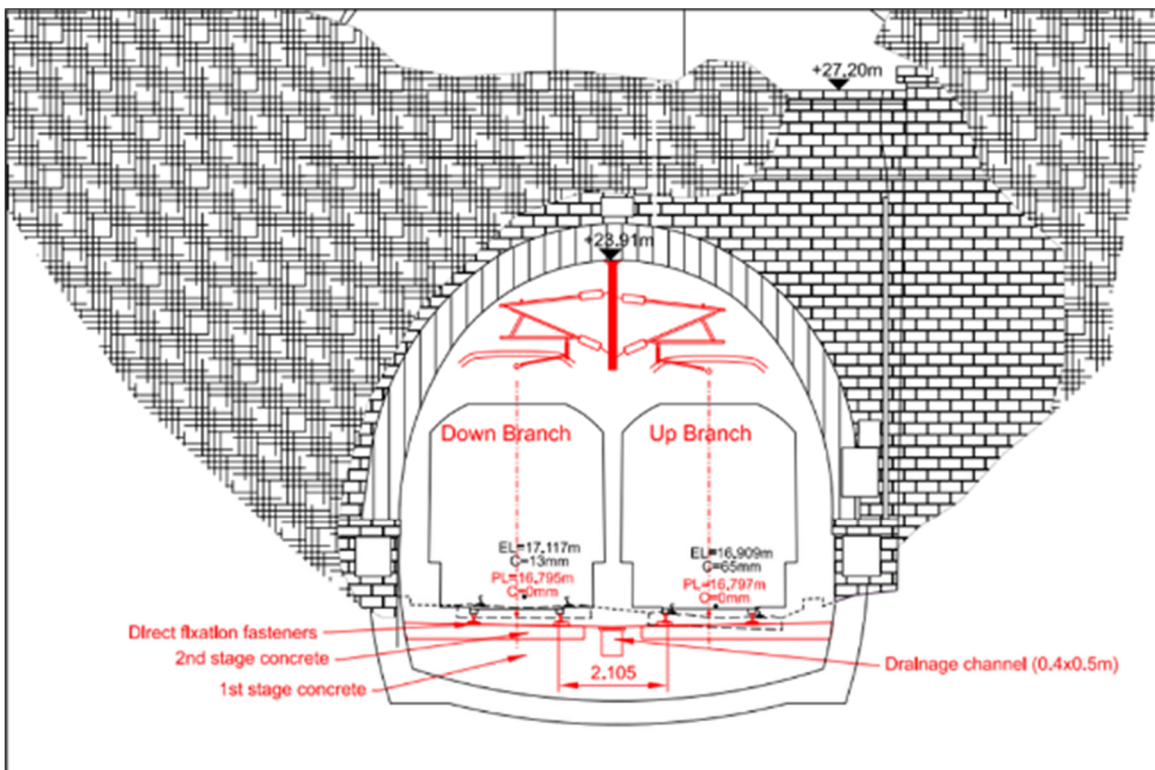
Phoenix Park Tunnel – Cross Section at Ch 8+056 – View From Glasnevin Junction
